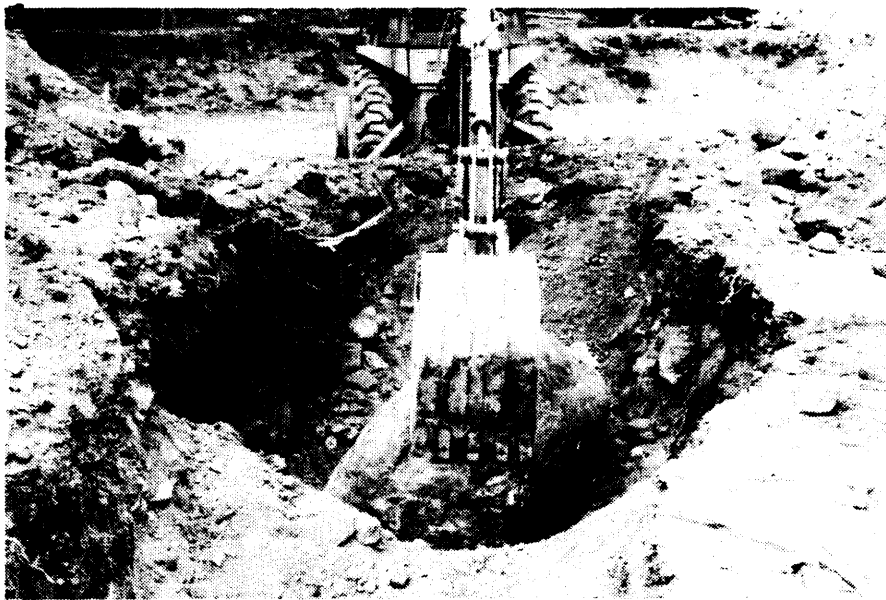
Boulder encountered in a house excavation in shallow gravel over till, north of Hilton lake (Twin Lakes).
